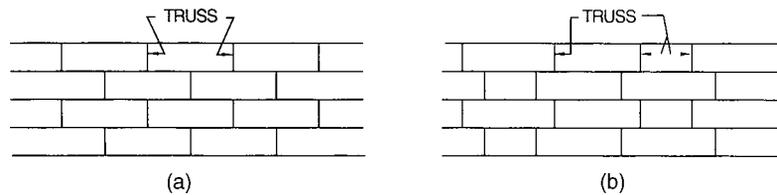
Stacking of trusses in staggered-truss systems. (a) Checkerboard pattern; (b) an alternative arrangement.
